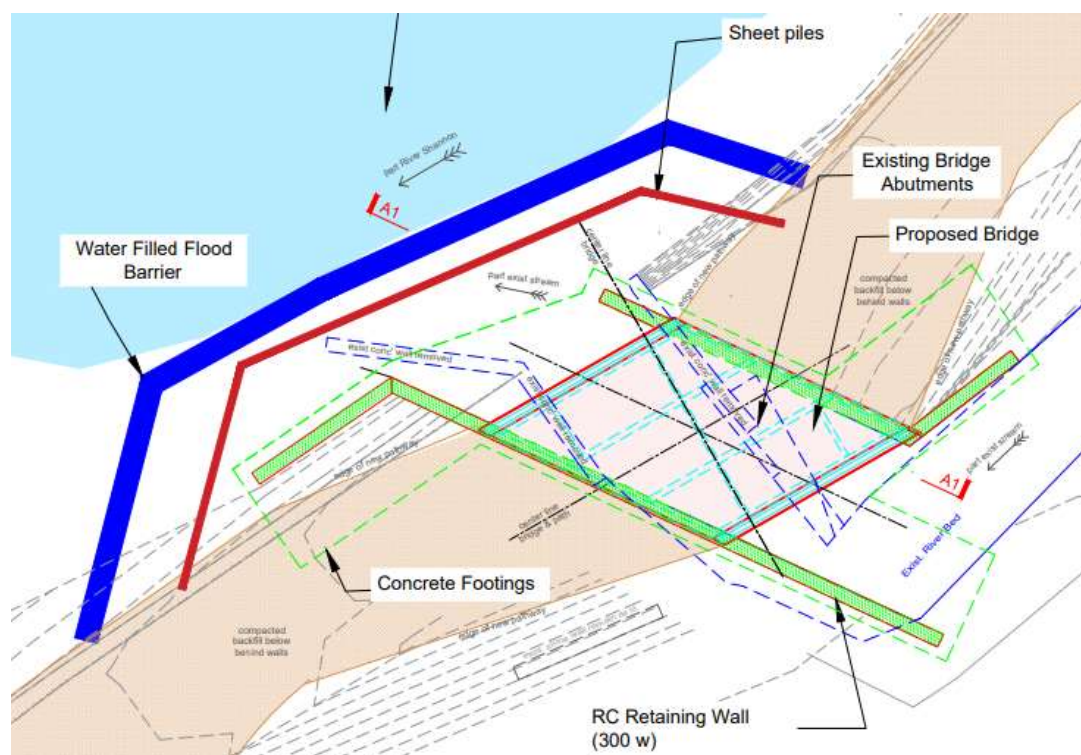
Proposed plan of Bridge 2, with ecology protection measures (refer to drawing RHA-XX-DR-S-SP0012)
